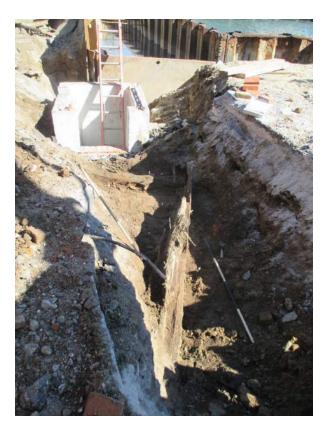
Two of the wooden elements comprising Feature 8, possible interior cribbing of Pier 102, found in the storm drainage trench excavation between CB 13.04 and CB 13.12, facing north (Image 5483: August 29, 2014).
